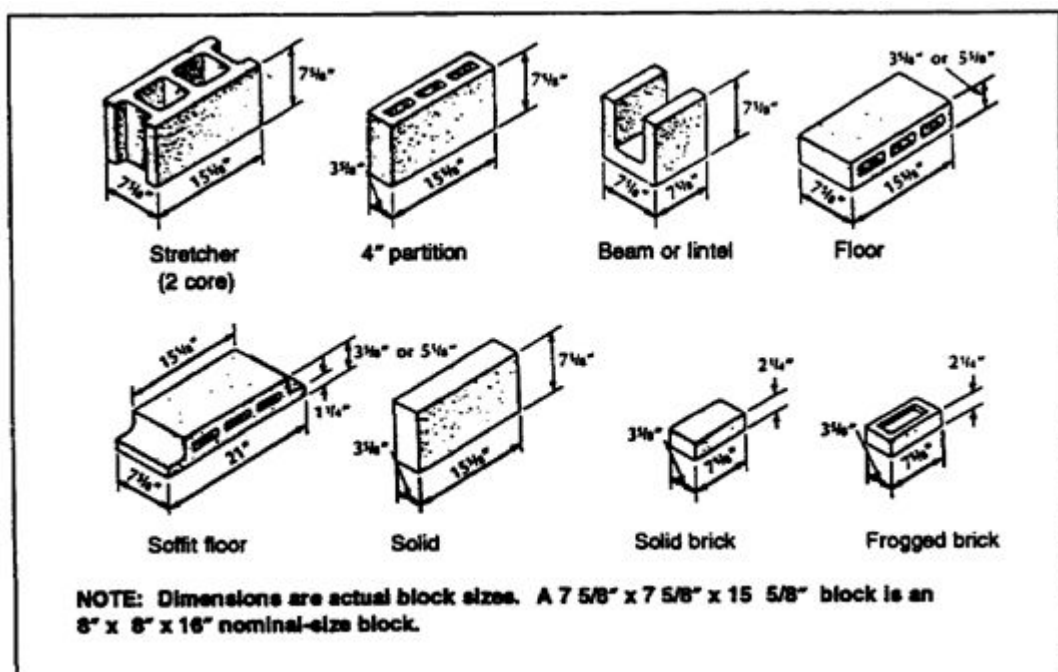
Typical shape of concrete blocks, taken from (<http://waybuilder.net>)
